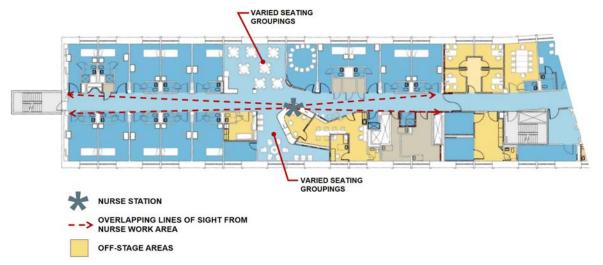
This illustration shows one end of the overall unit floor plan with an open Nurse Station in the center and a short corridor of Patient Bedrooms.
